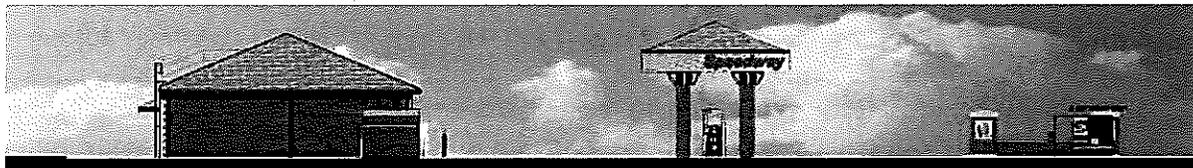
Left Elevation of Proposed Van Buren Speedway Development
